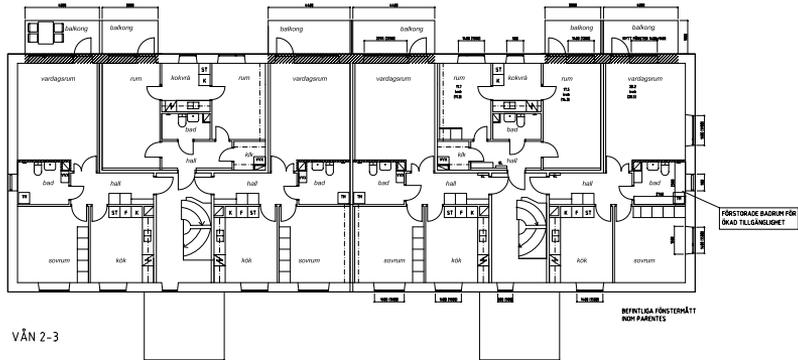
New floor plan with moved balconies (efem arkitektkontor).
